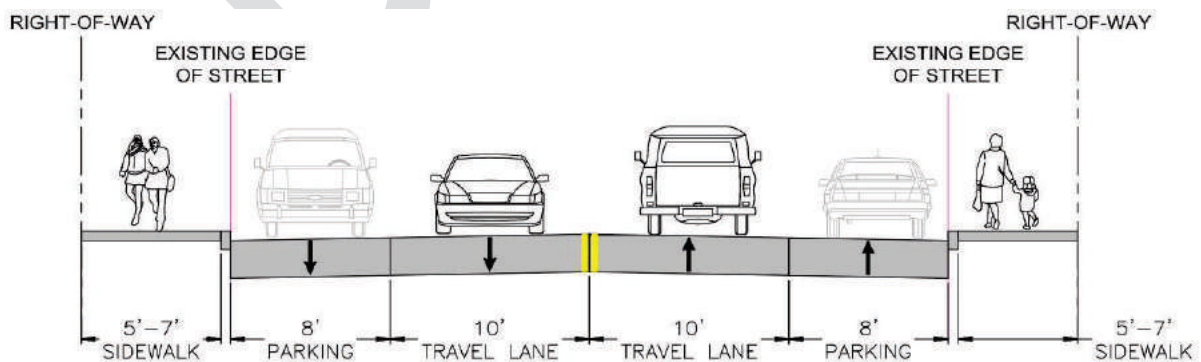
Coleman Avenue Existing Cross Section (City of Menlo Park) Looking East Toward Willow Road
